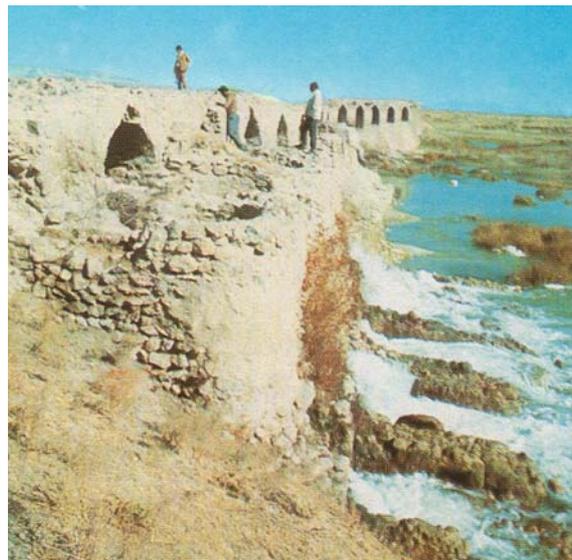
, Tilikan Weir Bridge on Kor River. Water-mills are in the picture.
